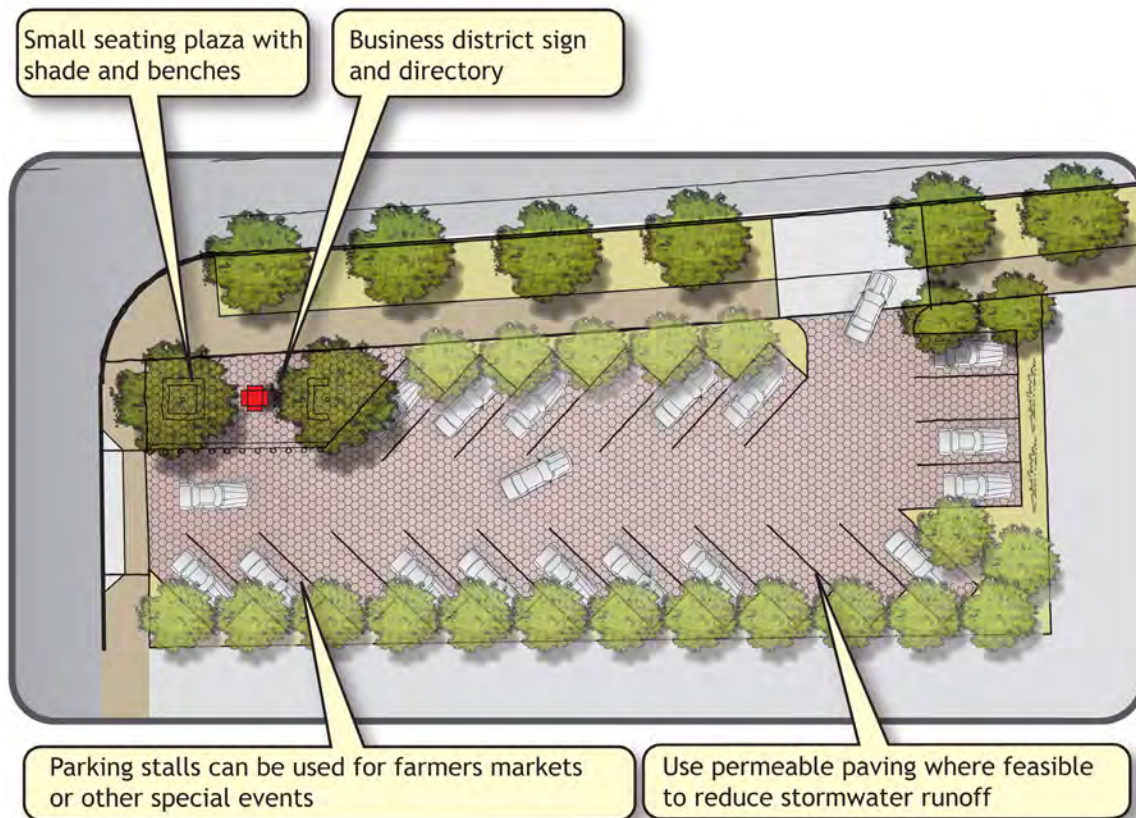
a: Illustrative plan drawing of a District Parking lot.
